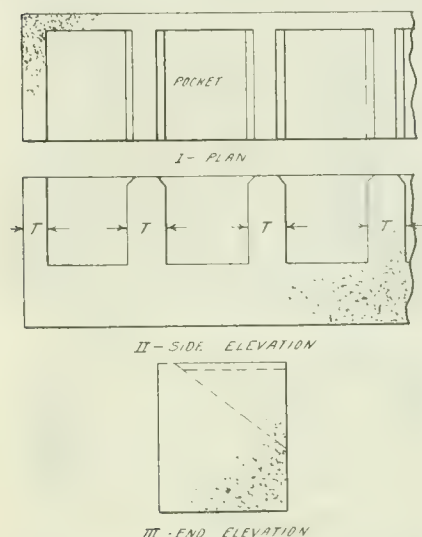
SIMPLIFIED VIEW OF A POCKETED FOUNDATION FOR A PLANER WHEN THE BASE LIES ABOVE THE FLOOR LINE.
